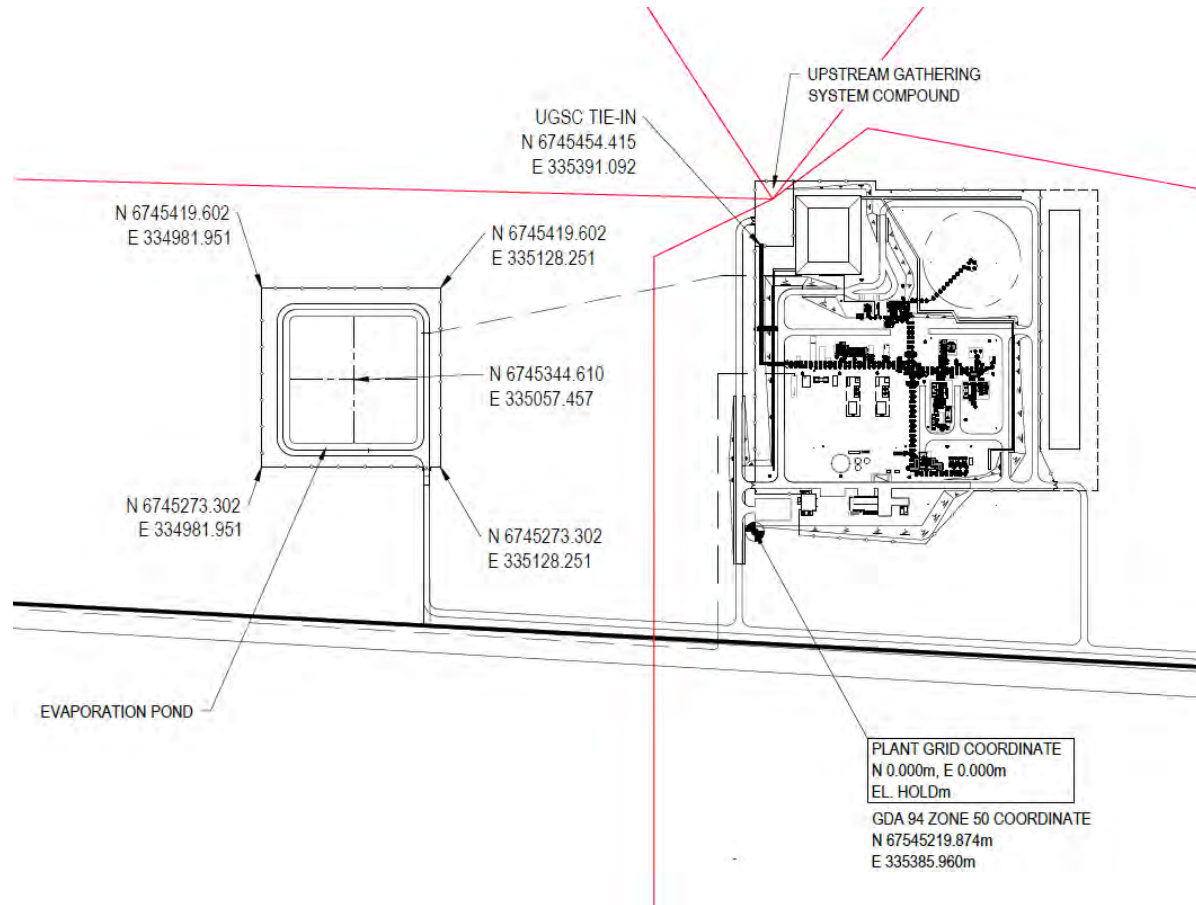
Proposed Gas Plant Layout (design subject to change)
